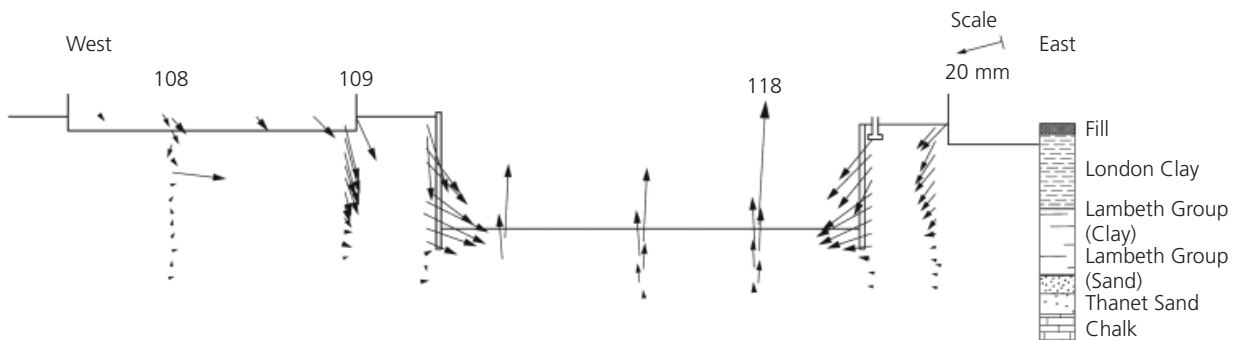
East–west section across south area, showing ground movements at end of excavation in 1987
